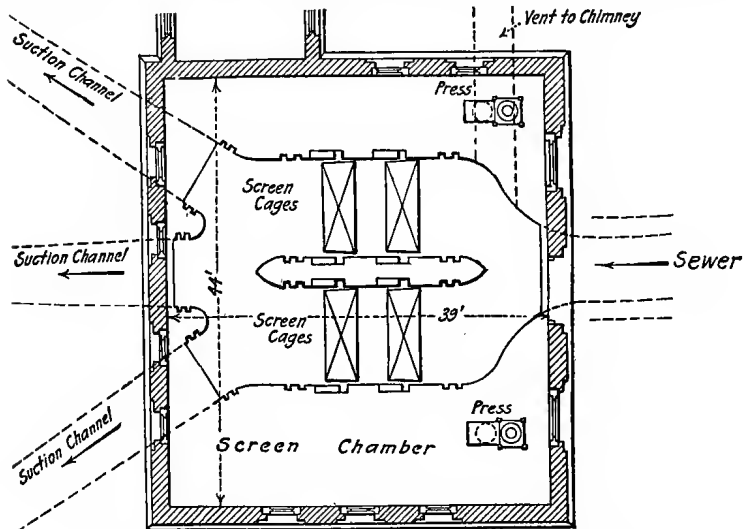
Rack chamber at Ward Street pumping station, Boston.
